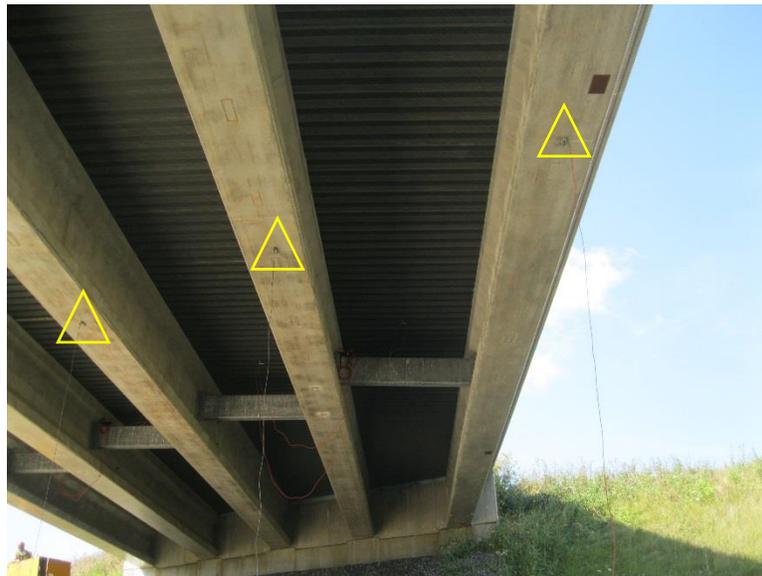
US 151 northbound over STH 26 Service Road girder strain gages
